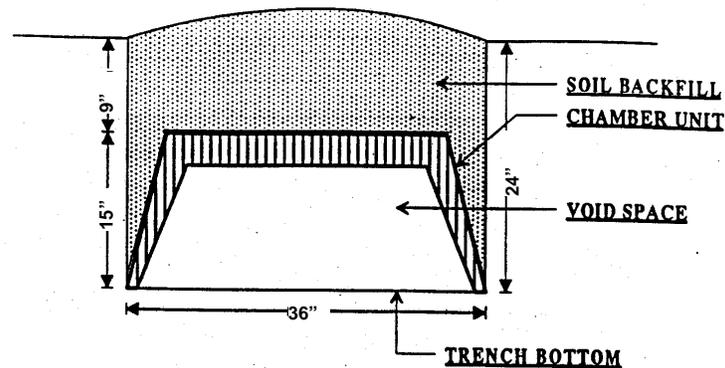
Typical Gravelless Chamber Drainfield, Cross-Section
